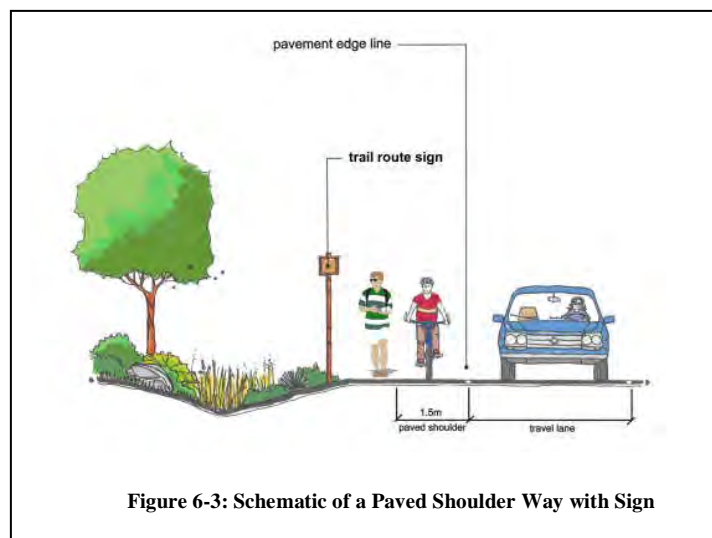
Schematic of a Paved Shoulder Way with Sign
